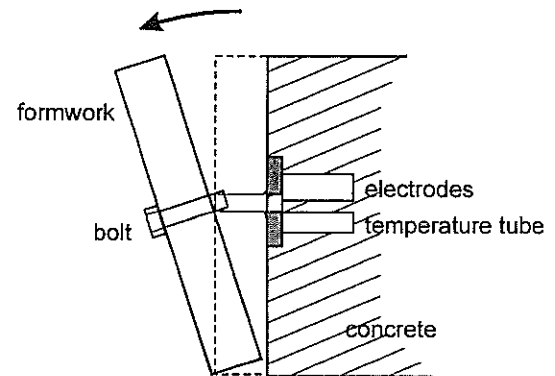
Cause of damage, removing formwork without removing connection bolt
